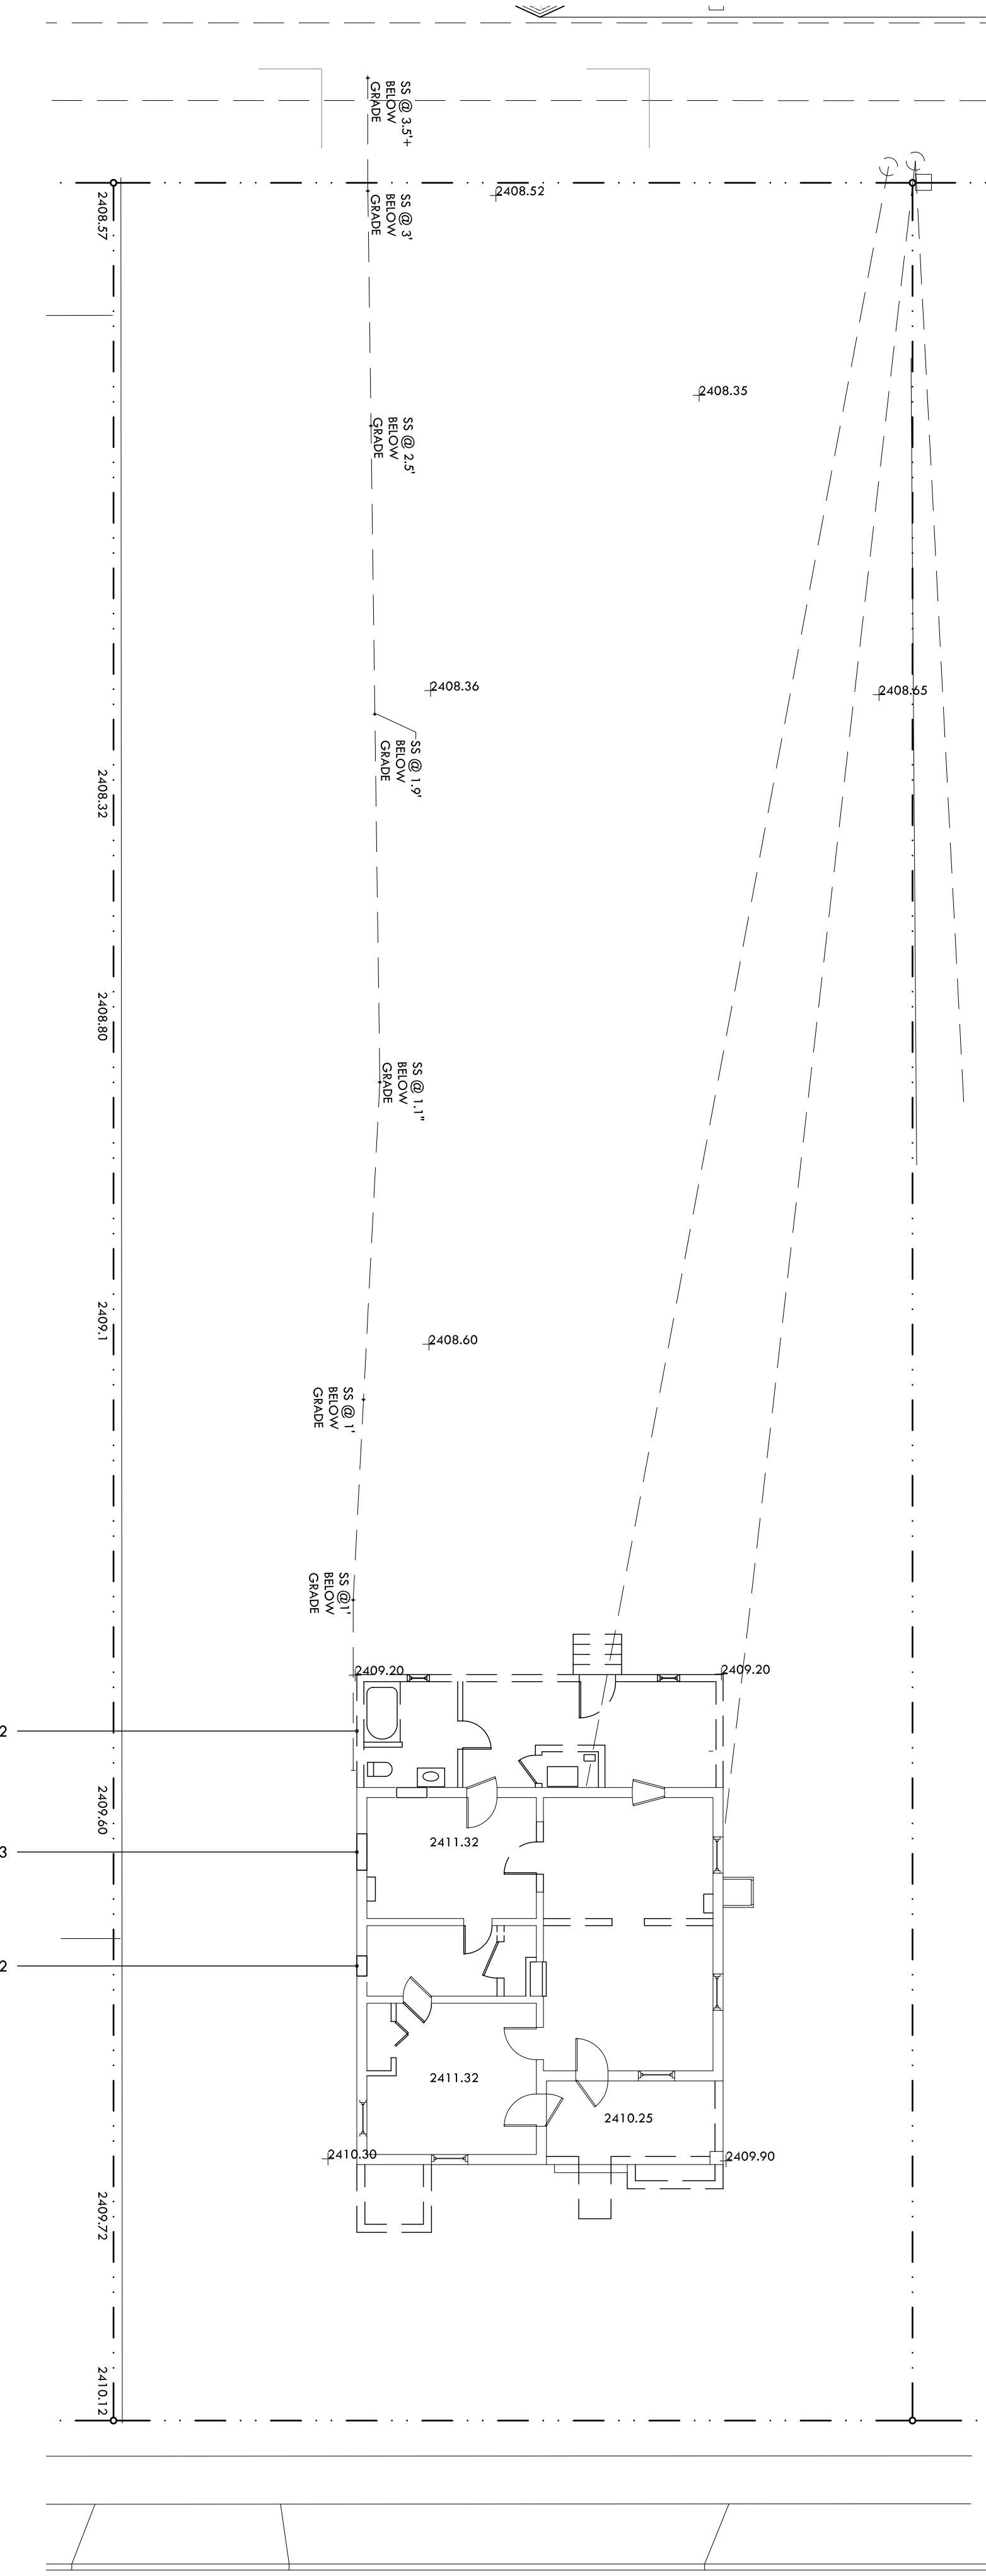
FIGURE GROUND PROPOSED - REVISION IS ADDING 827 S ARIZONA AVENUE
